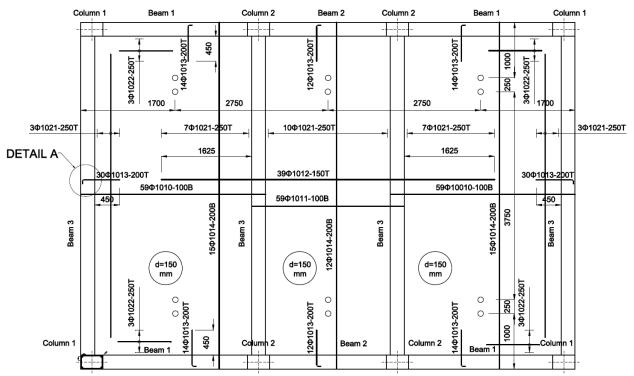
Slab reinforcement, T indicates top and B bottom reinforcement
